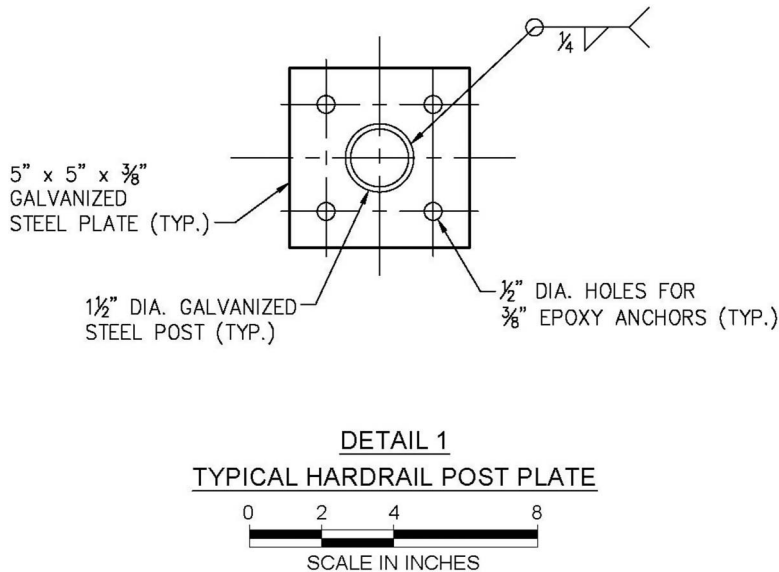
P-12. Detail 1 Typical Handrail Post Plate, before Dimensioning
